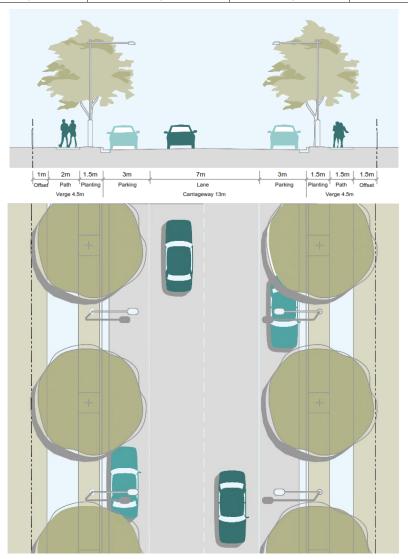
Typical Plan and Section - Collector Road - Tier 2
